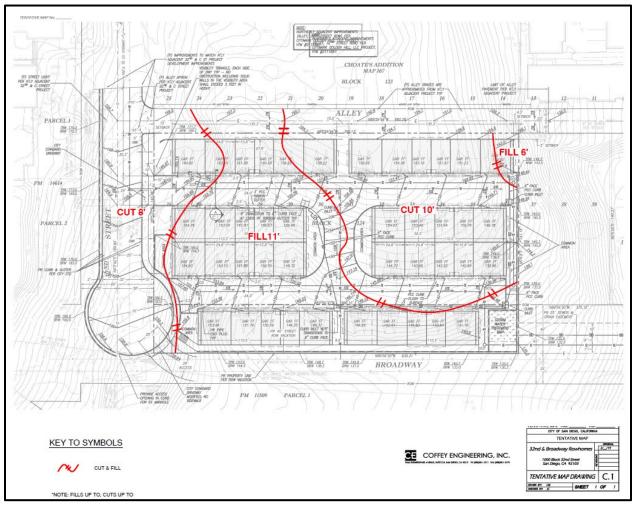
Anticipated Earthwork at The Site (source: Coffey Engineering 2019)
